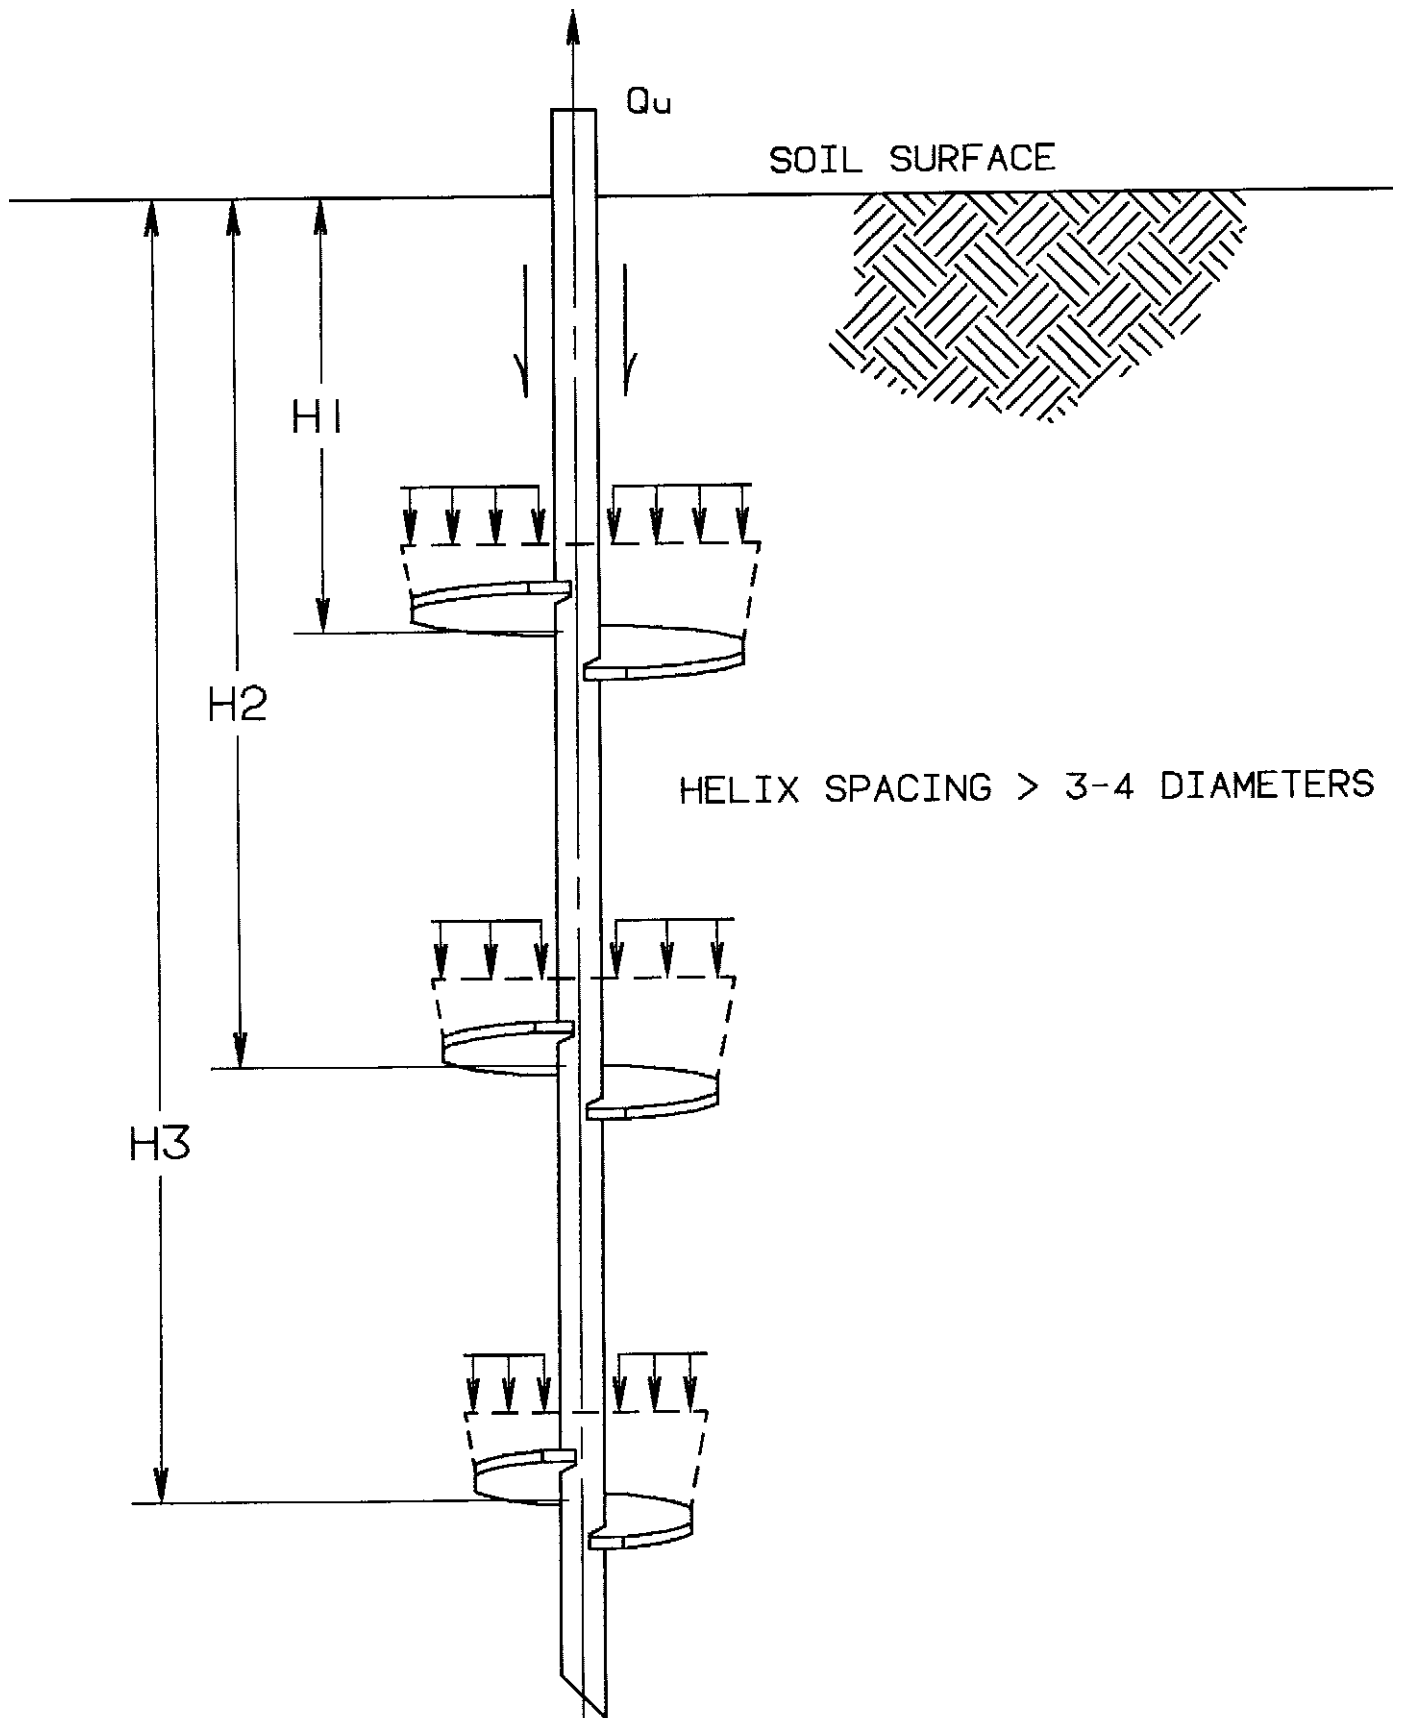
PLATE BEARING FAILURE INDIVIDUAL HELICES
